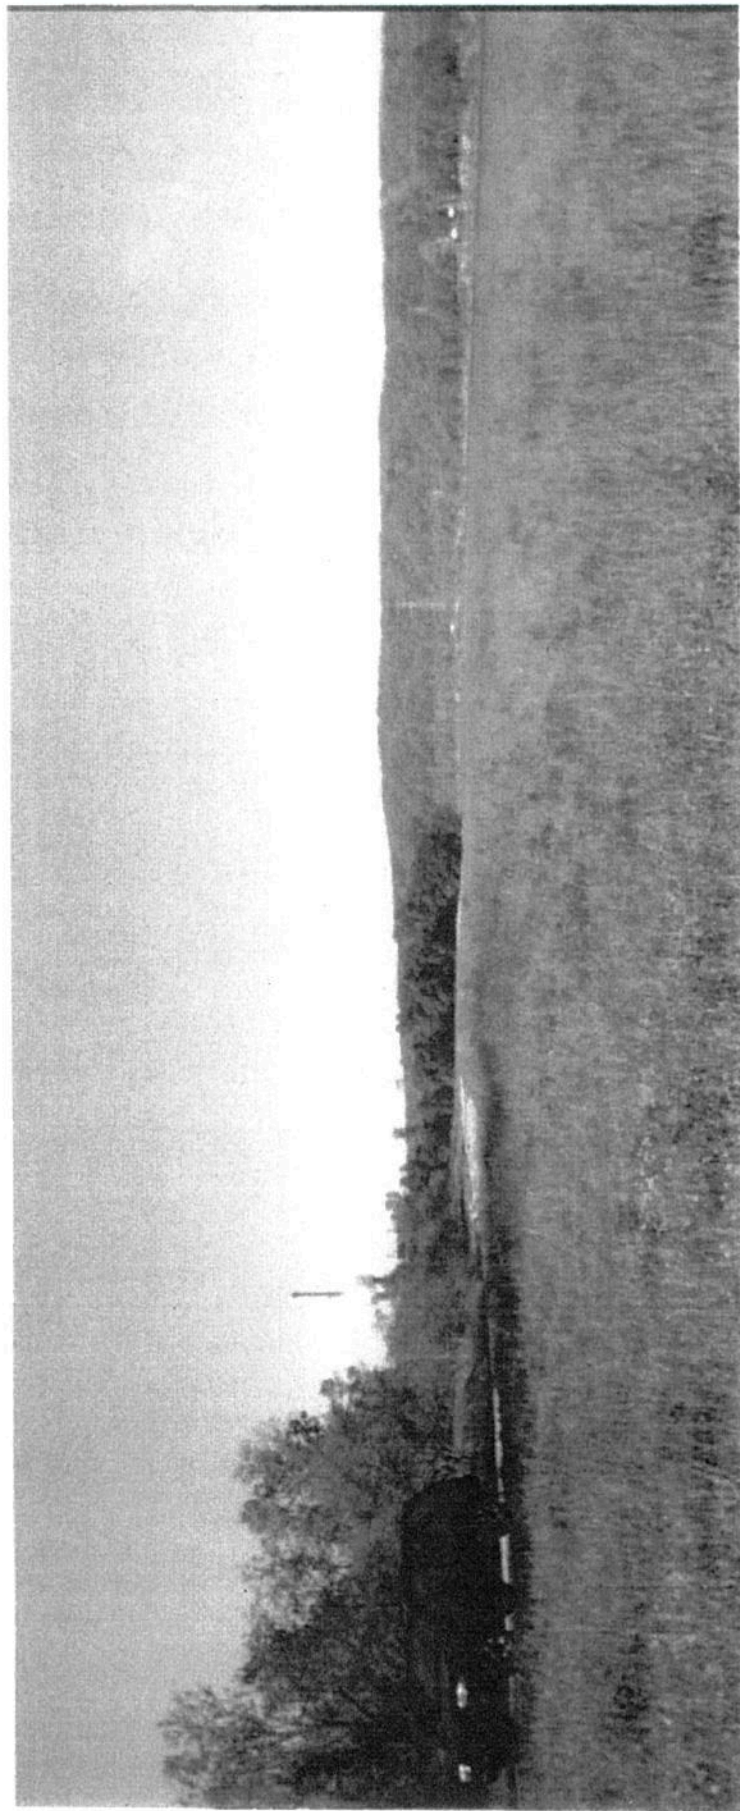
View of gas collection system along central tract of landfill from former Putnam Street entrance to landfill. View to the north. Blower house in extreme right portion of picture. Note ATV track in foreground of picture. Gravel road is road along top of floodwall.
